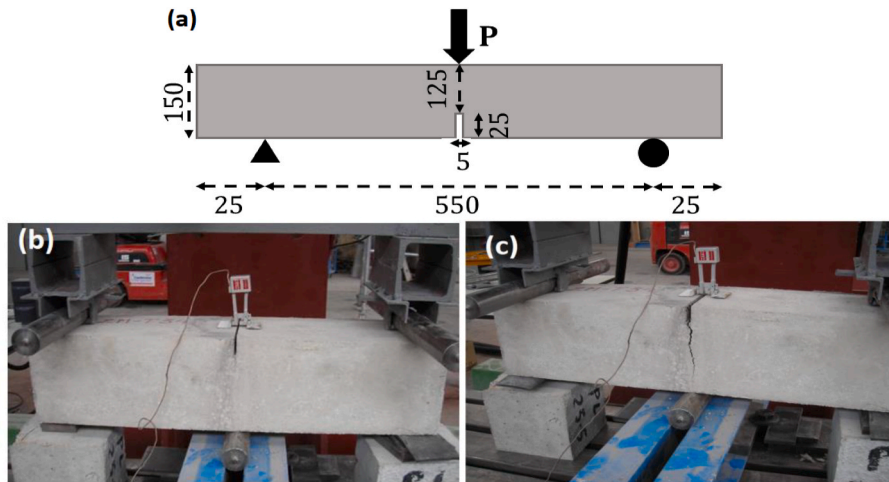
Second bending test performance: (a) notch dimensions; (b) test set up; (c) failure point.
